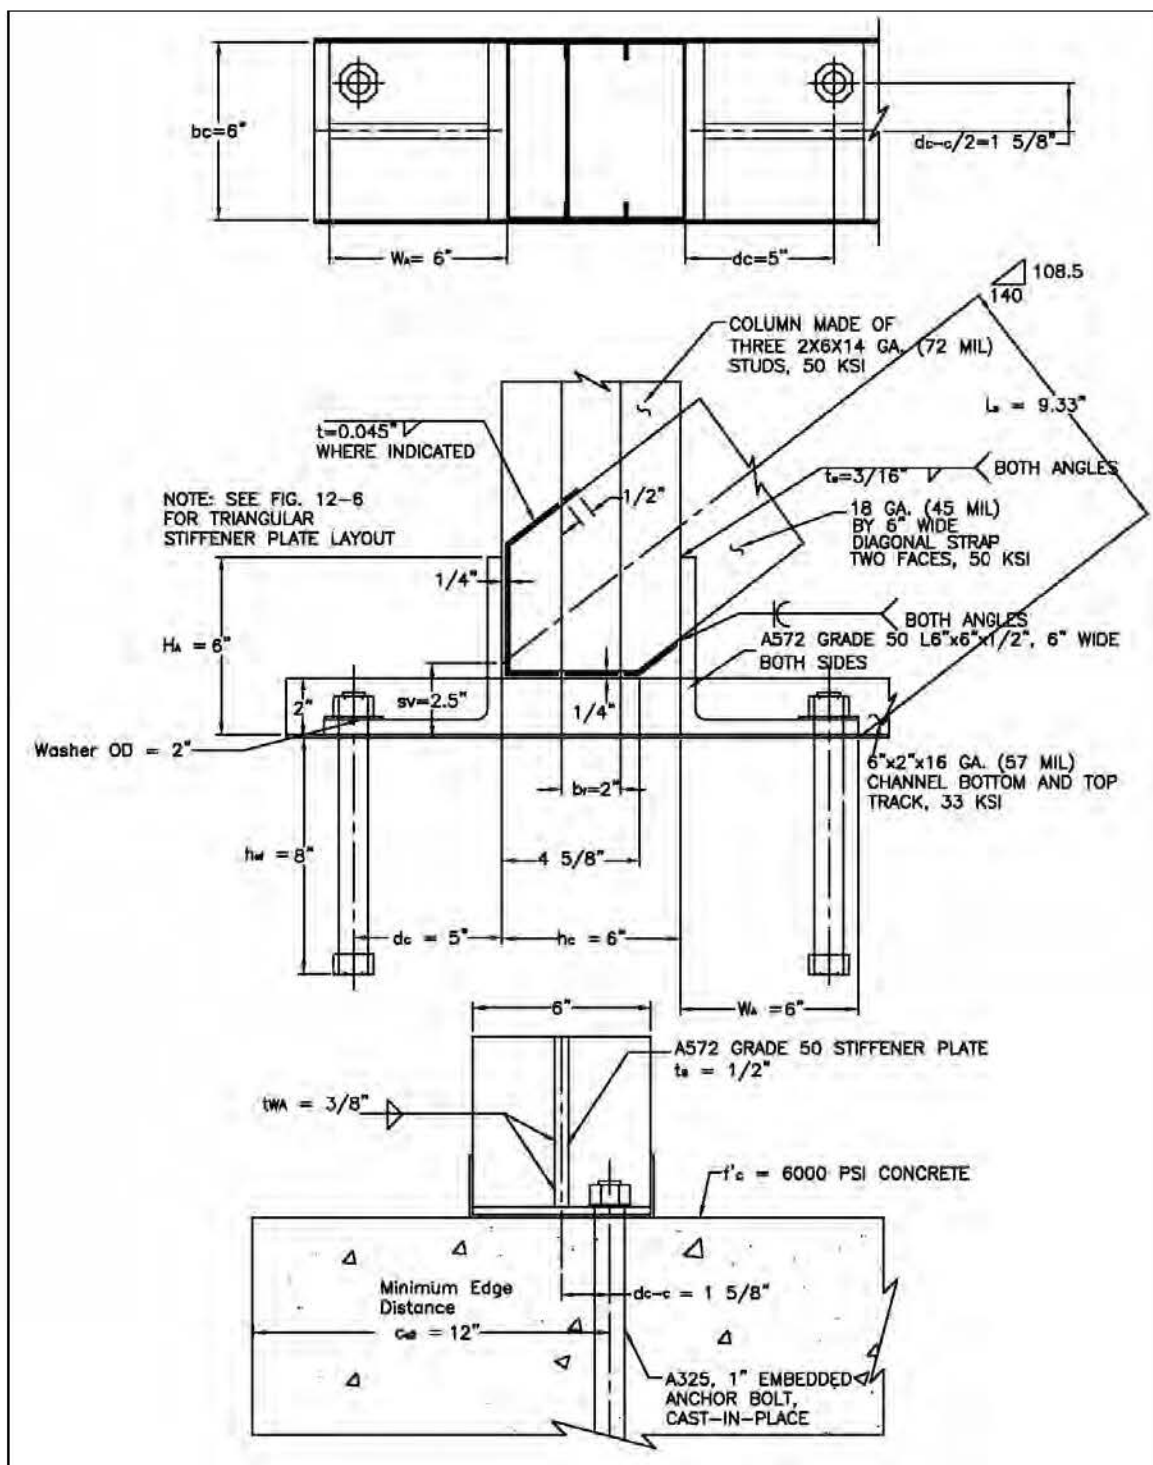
Example connection/anchorage detail (seventh row of Table 12-6 and Table 12-9 through 12-22).
